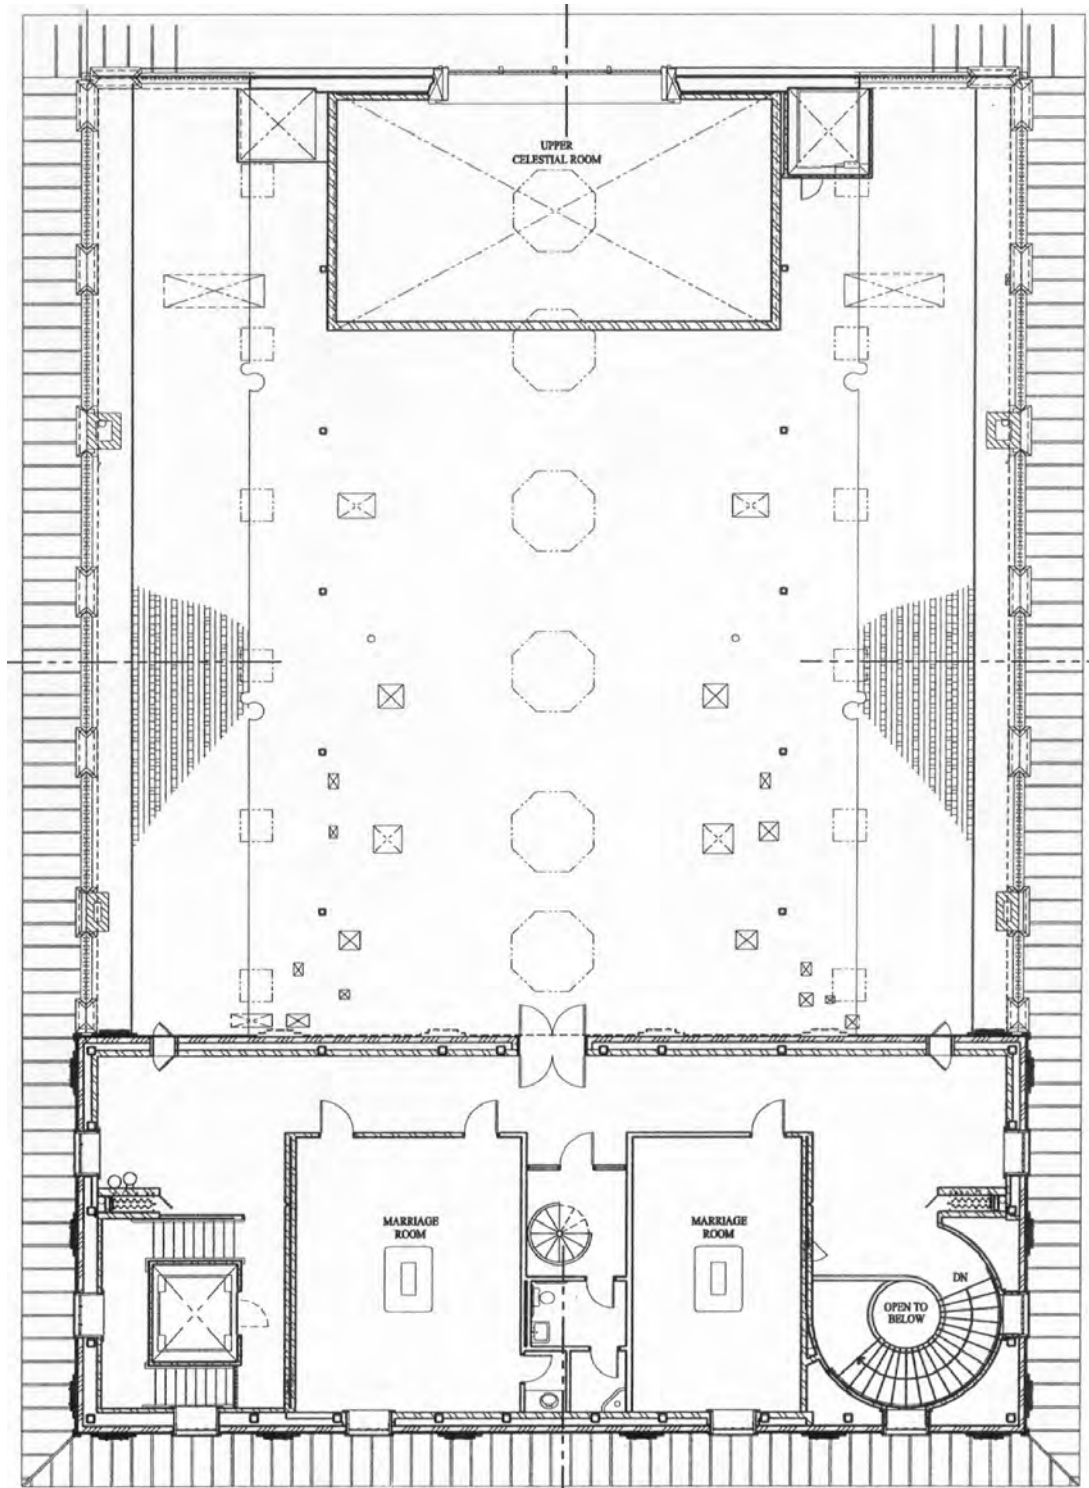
Attic floor plan of the new Nauvoo temple. Compare with original plans of the main floor on Figure 9. Courtesy FFKR Architects.
